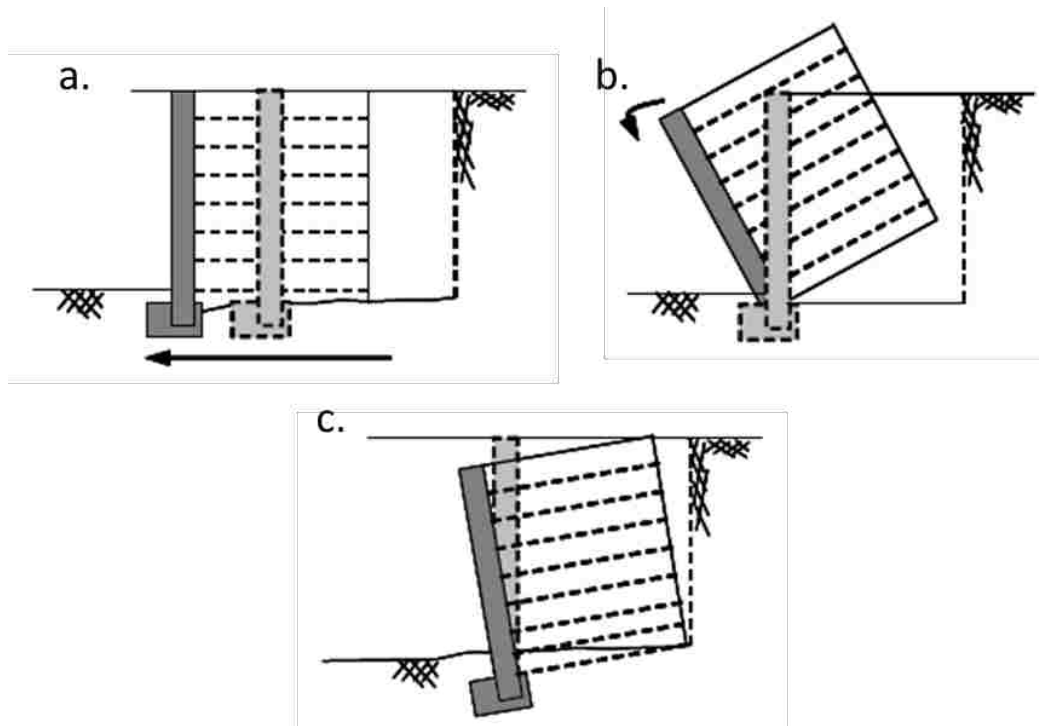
External stability failure cases: (a) sliding, (b) overturning, and (c) bearing.
